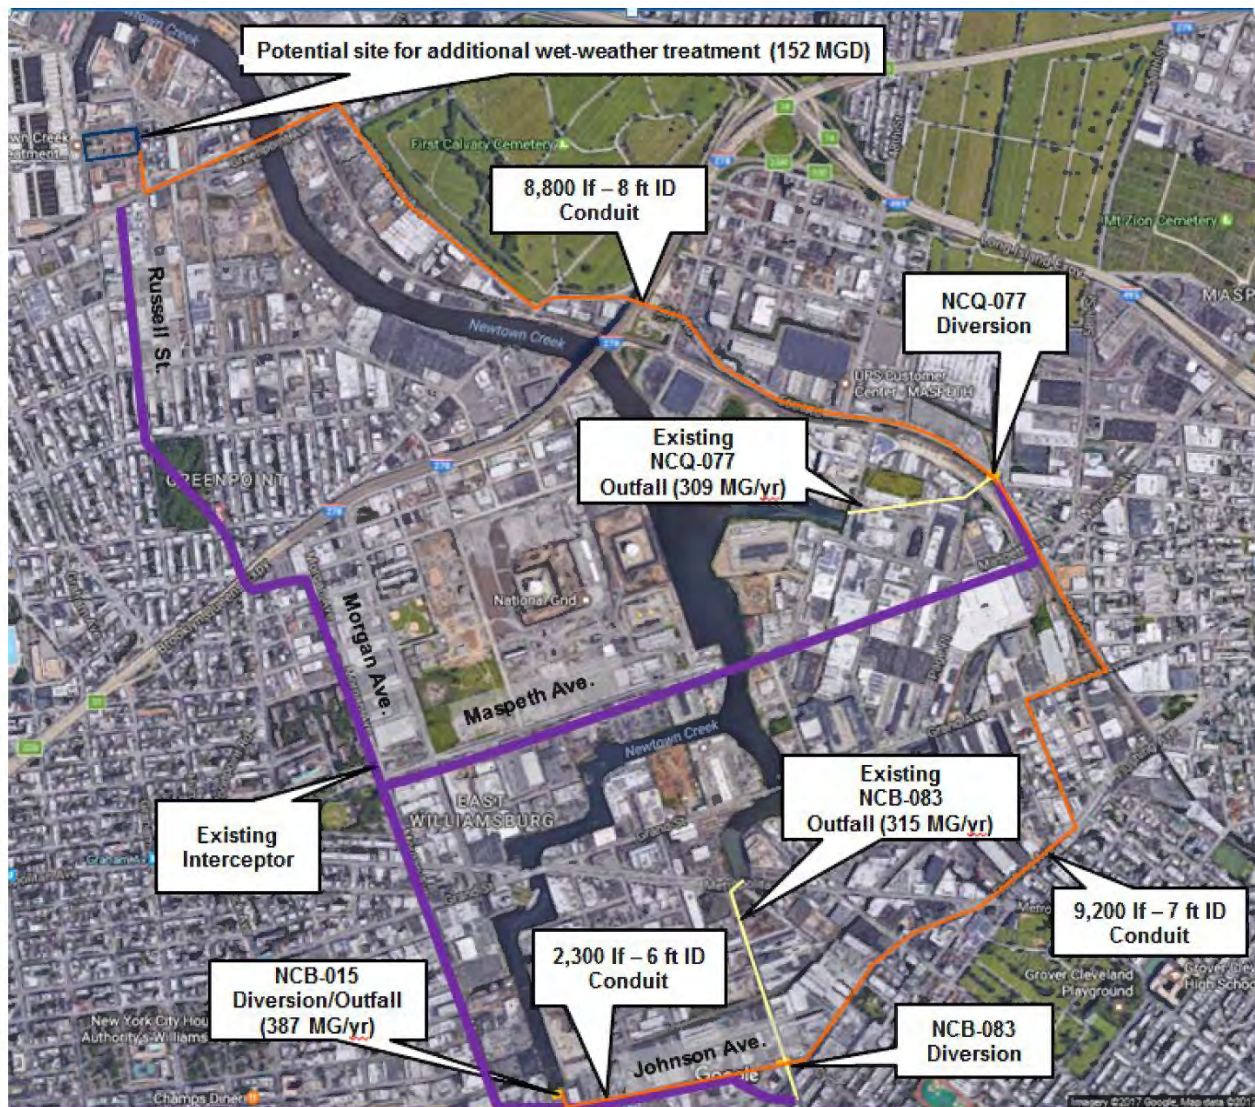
Layout of Alternative RTB-1 – Retention Treatment Basin with Consolidation Conduit for Outfalls NC-015, NC-083 and NC-077
